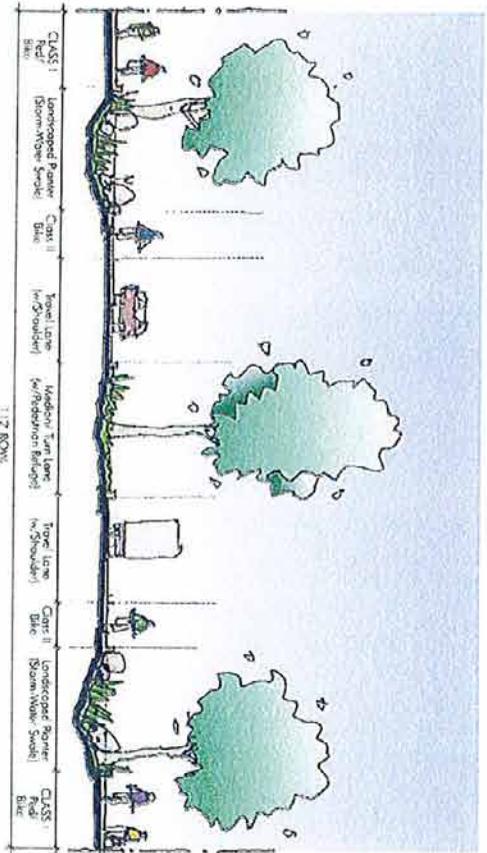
CROSS SECTION OF COMPLETE STREETS CONCEPT A (RAILROAD AVENUE TO EAST MAIN STREET)
